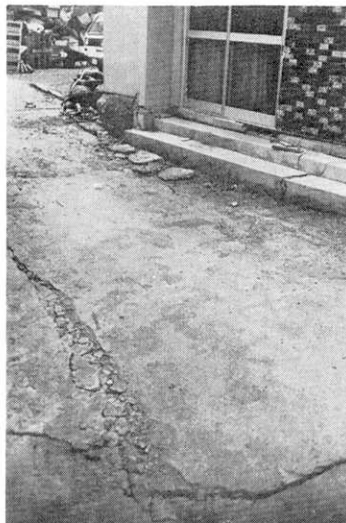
Cracks in the road and in the concrete foundation at loc. S-10.
